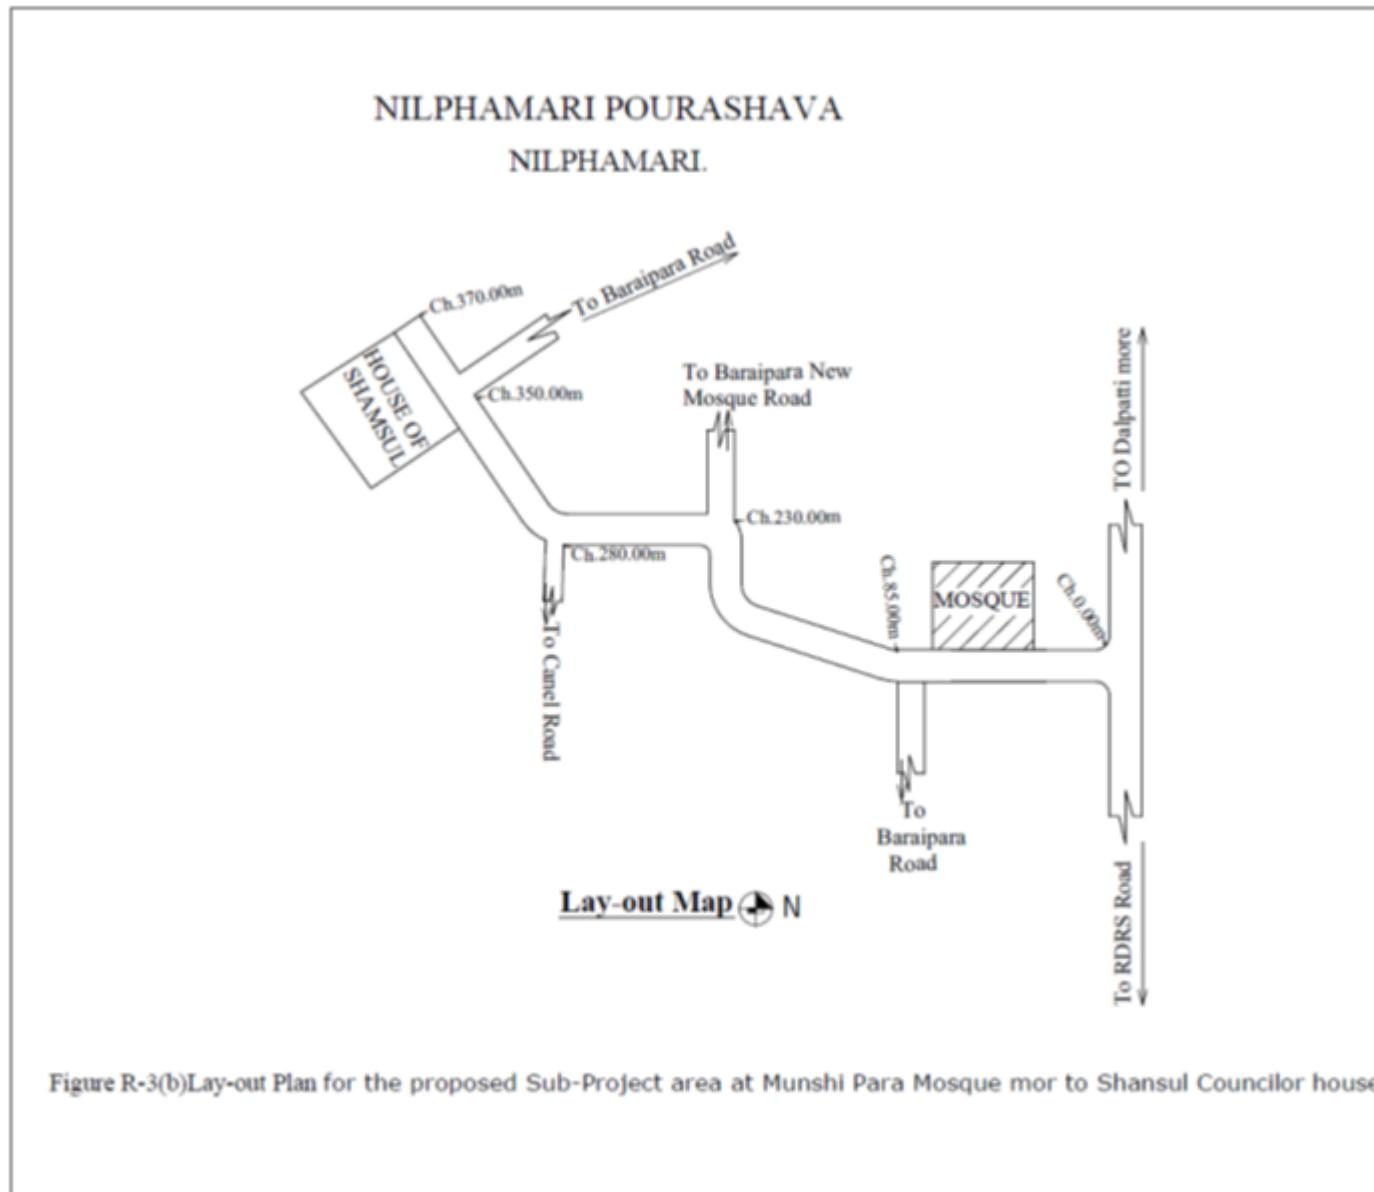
Layout Plan for the Proposed Subproject Area from Munshipara Mosjid Mor to Shamsul Councilor House
